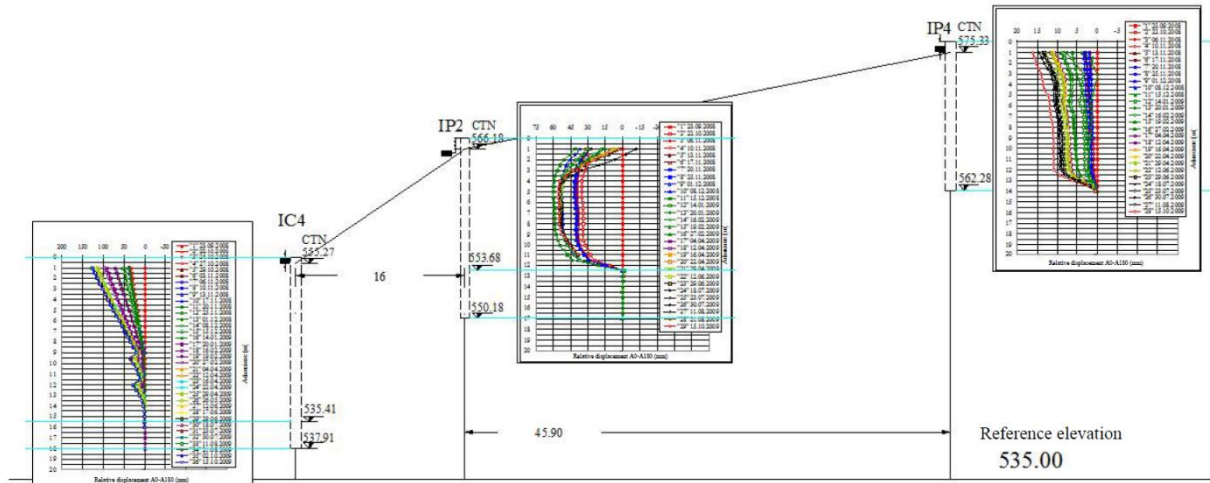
Cross Section through the Slope and Retaining Structure (reference Inclinomeric Systems IP4-IP2-IC4)
